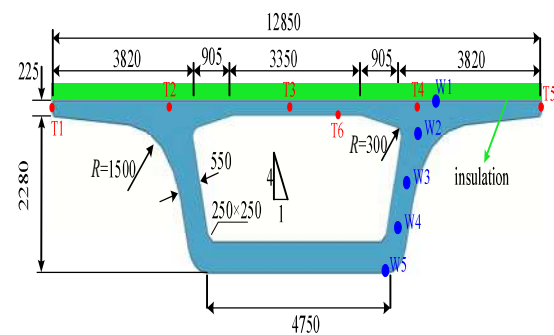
Cross-section layout of the box-girder and thermocouples position; (Unit: mm)
